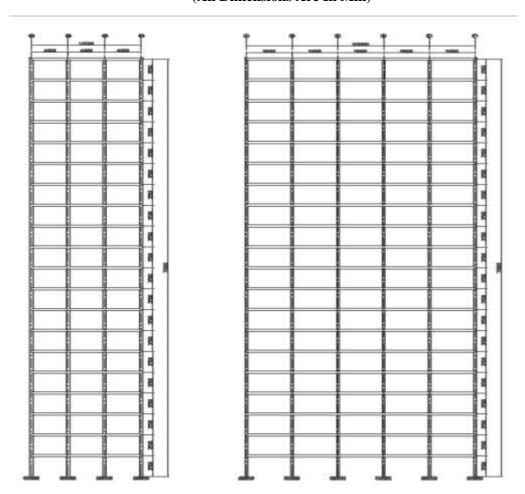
Frame (A-A) and (01-01) of Twenty-Story Regular RC Building (All Dimension Are In Mm)
